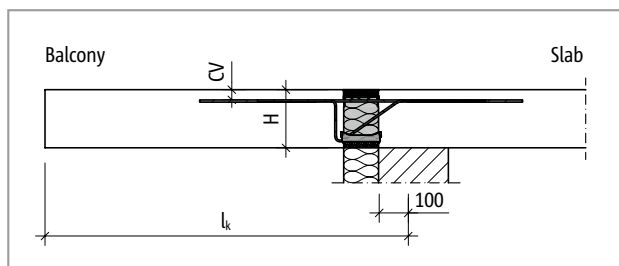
Schöck Isokorb® XT type K-M1 to M10: Static system
